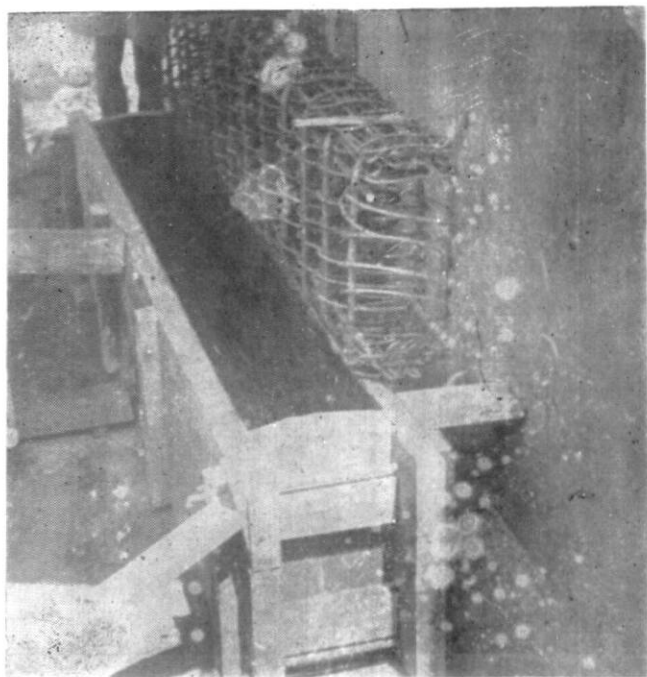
Fig. VI. Reinforcement for R.C. rollers (cast-in-situ) being placed in position.
